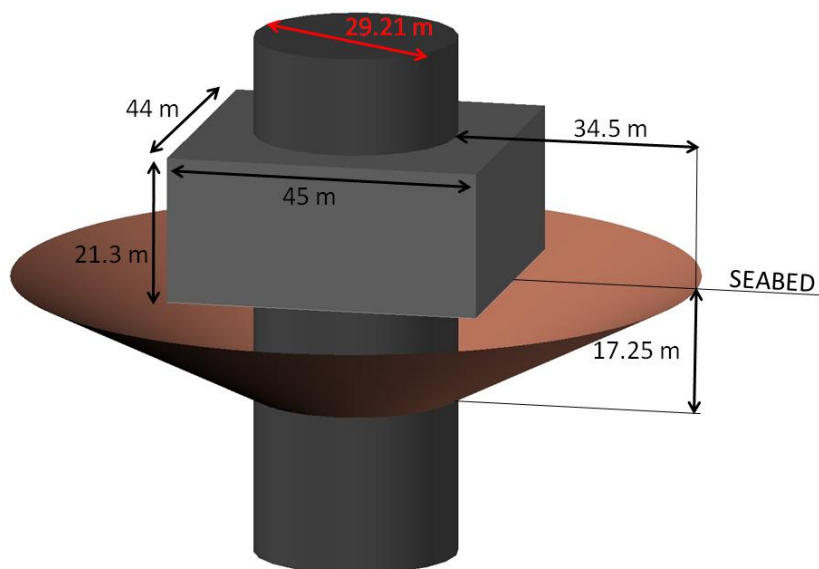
3D Rendering SW Anchor Scour Equivalent Pier
